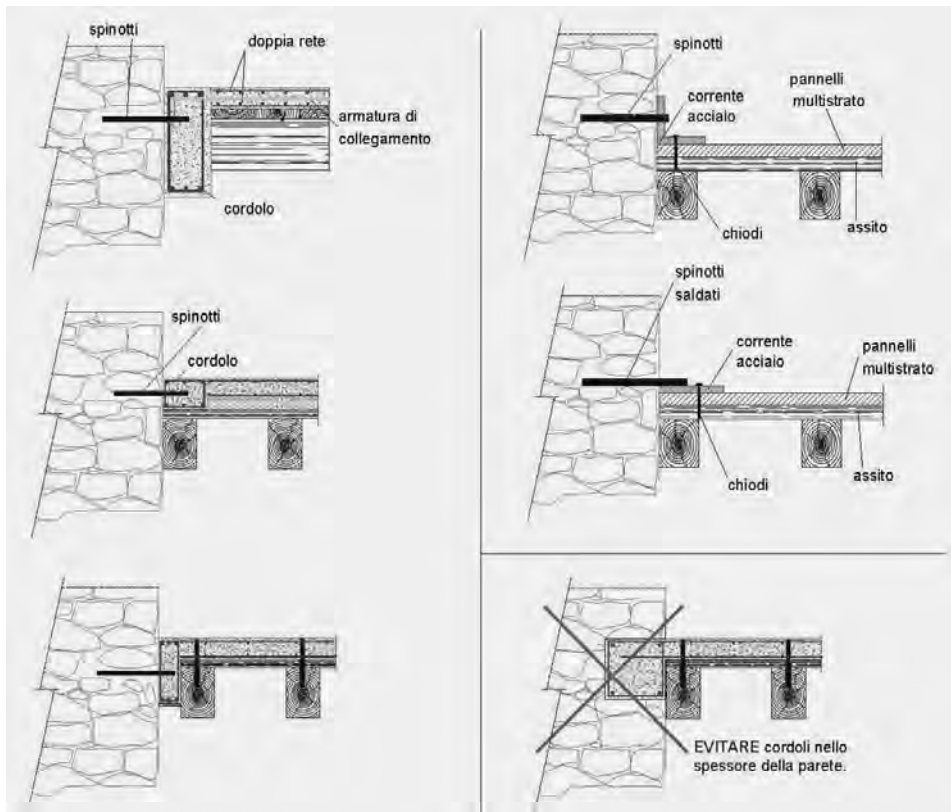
Different solutions for the ring beam and the connection to the timber floor.
